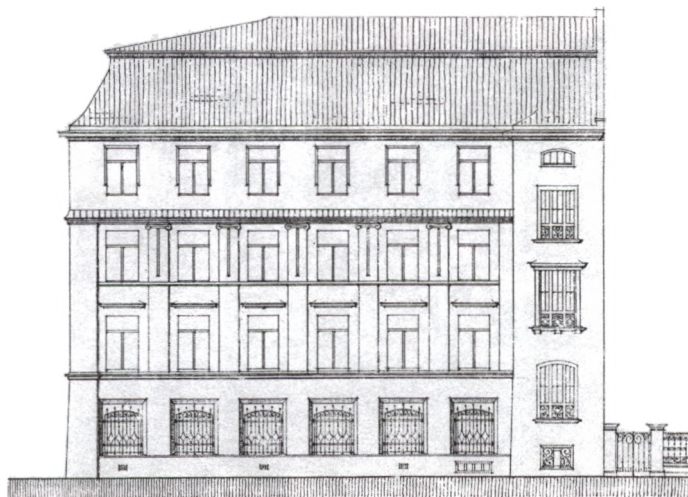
Henryk Lamensdorf, design of the facade of the school building of Society of Popular and Secondary School (Hebrew Secondary School) at 3/5, Brzozowa Street, 1914 r. AP Kr, Archiwum Budownictwa Miejskiego (Archives of Municipal Building), later referred to as ABM, ul. Brzozowa 3/5, fasc. 87
